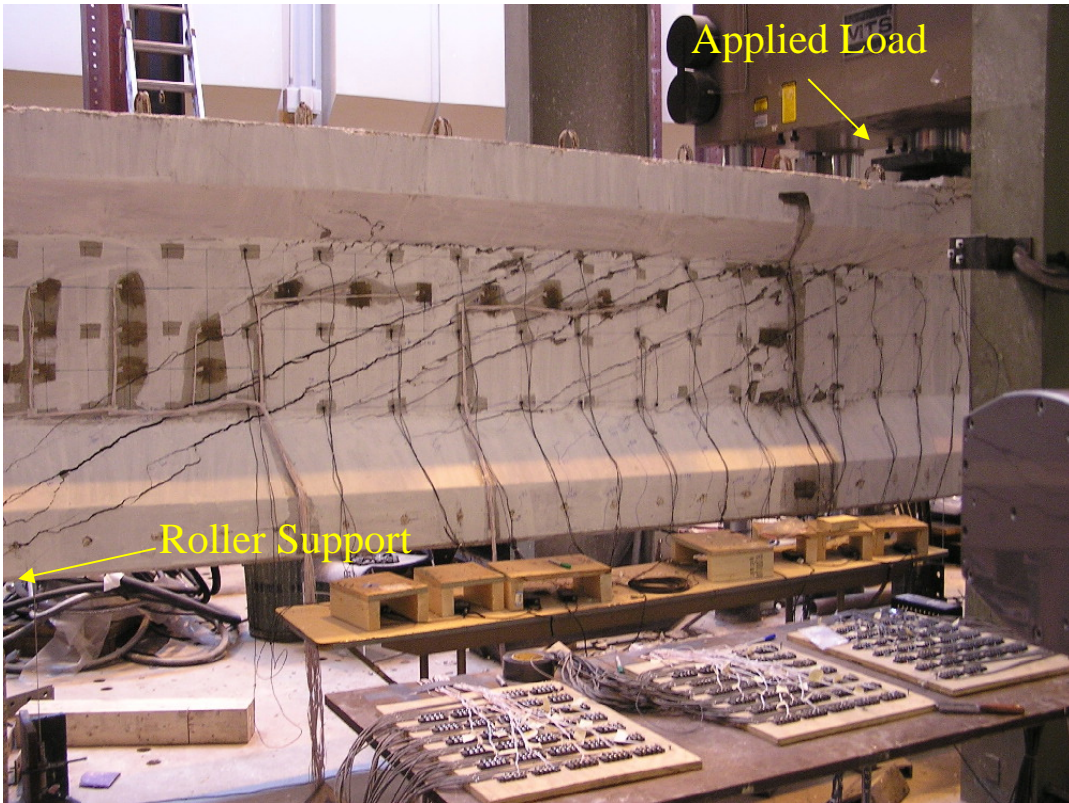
Photograph of Cracking at 44% Past Peak Applied Load (Specimen II)
